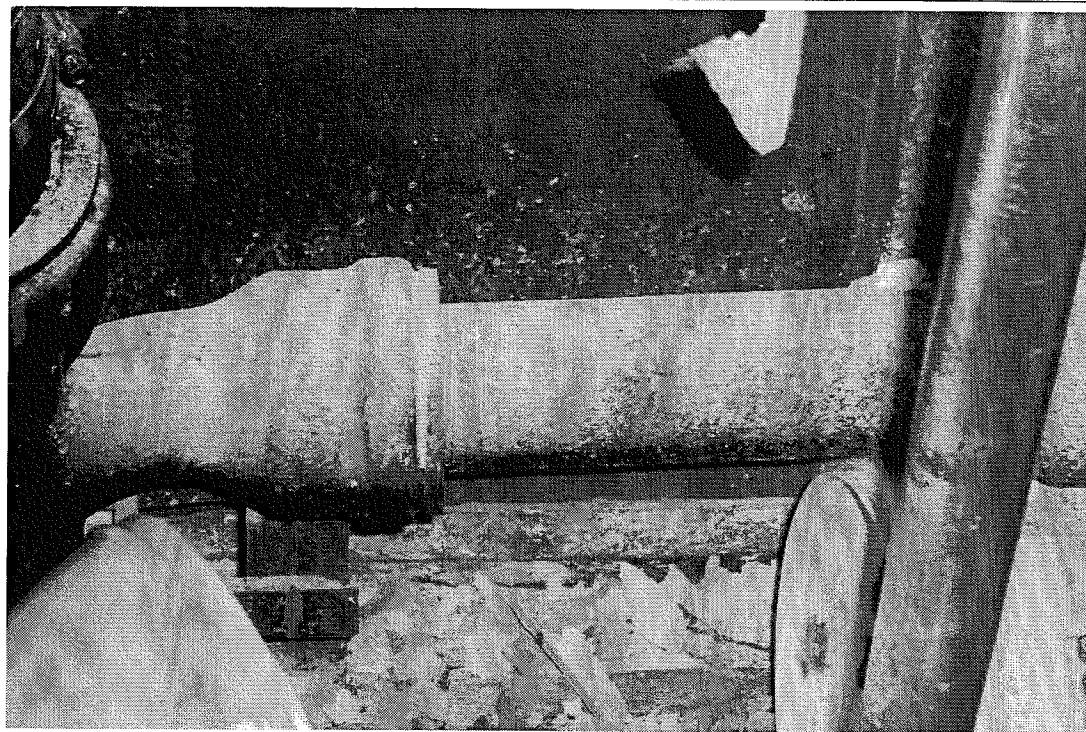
Annex 6th floor, adjacent to Women's RR - View of delaminated fireproofing dust and debris on iron pipe in wall (dust sample #2)
